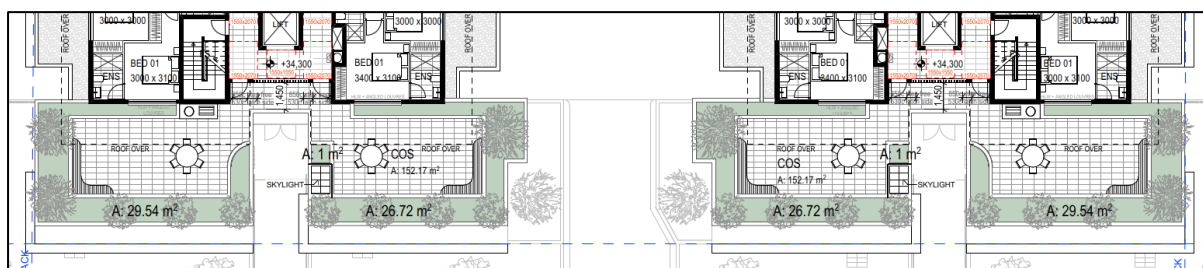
Extract of Fourth Floor Plan (Source: Drawing No. A1005)
